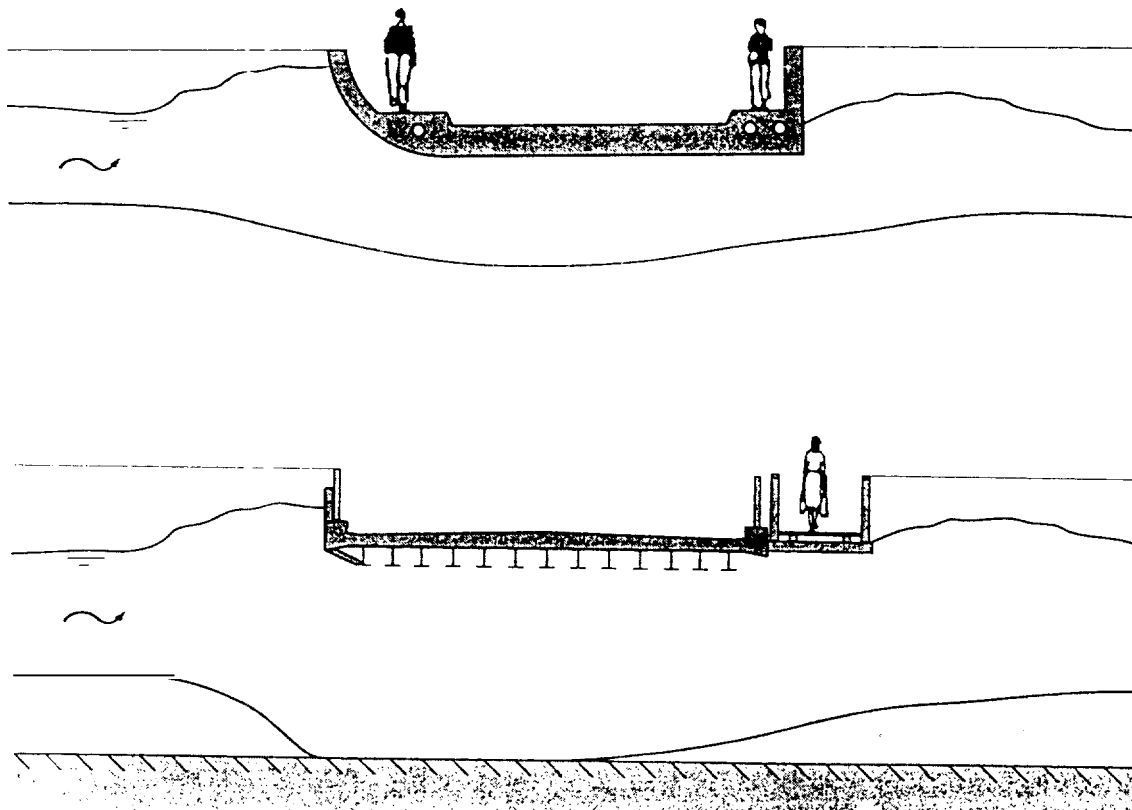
Shield backup bridge, schematic streamwise section, design example of Cimavilla bridge at Poschiavo, Switzerland.
